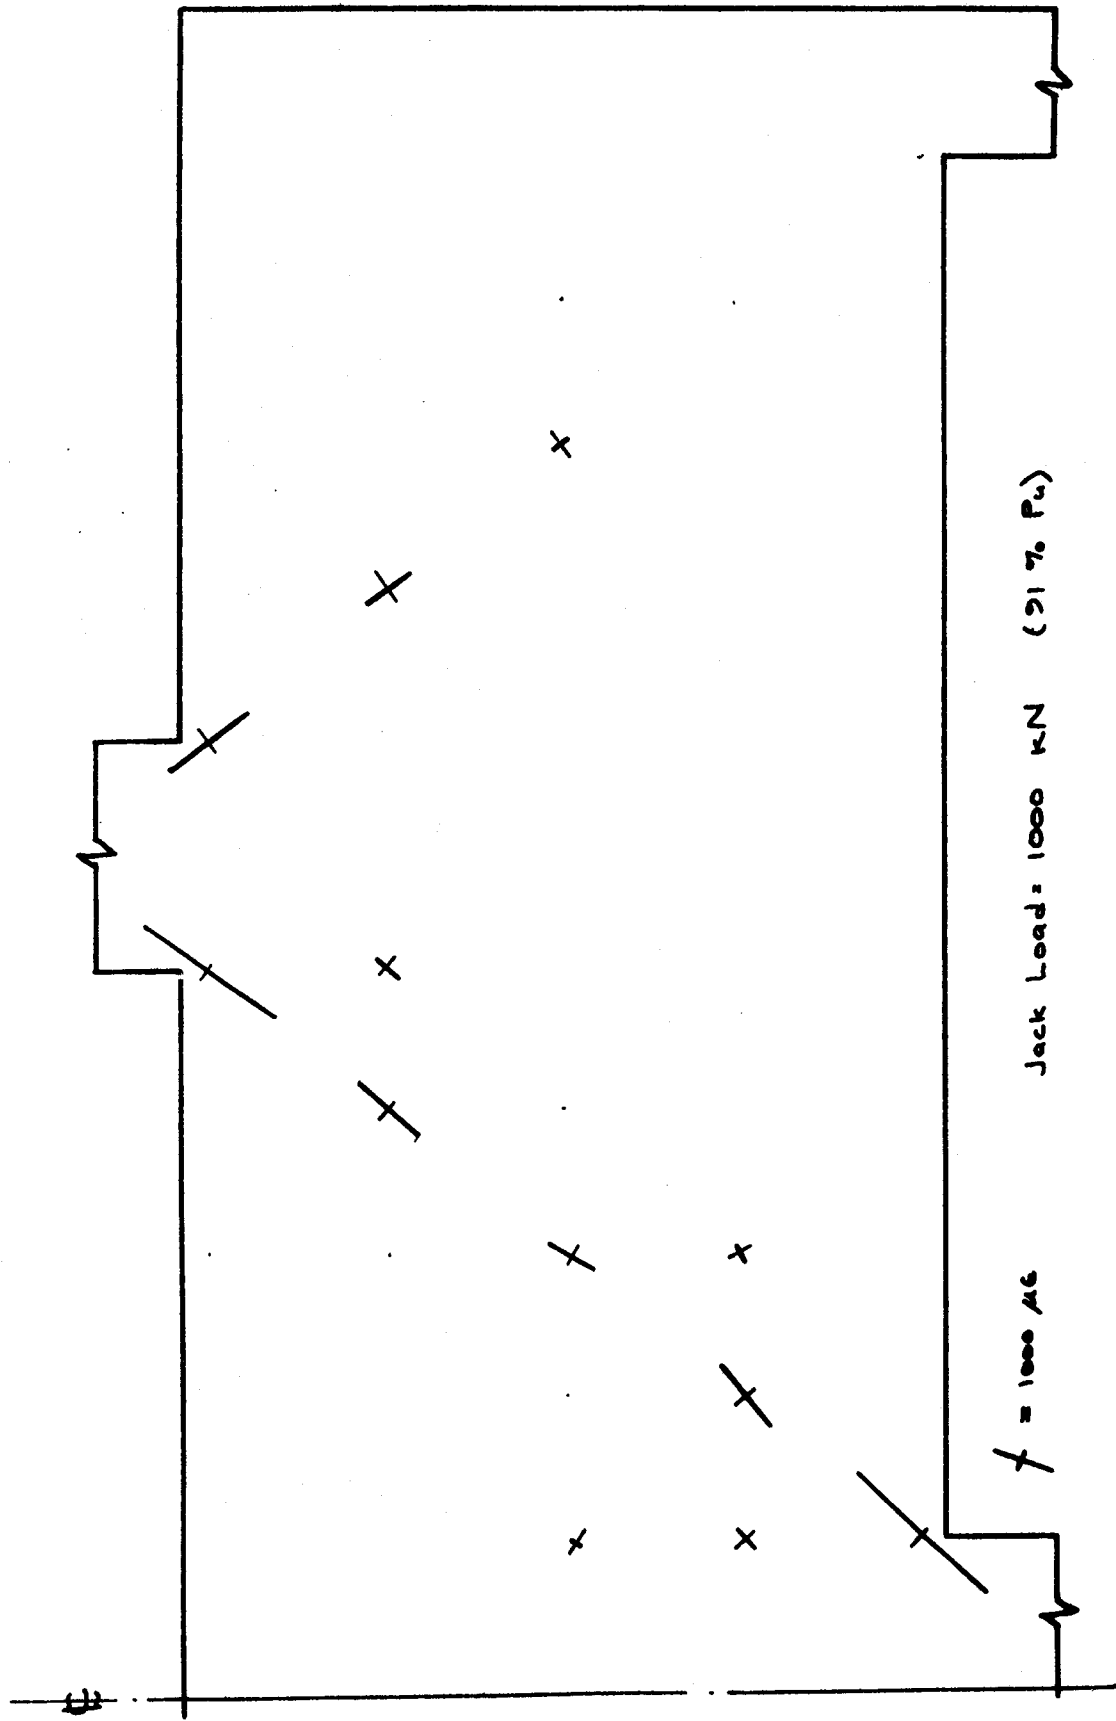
Beam 3/1.0 Concrete Compressive Strains
